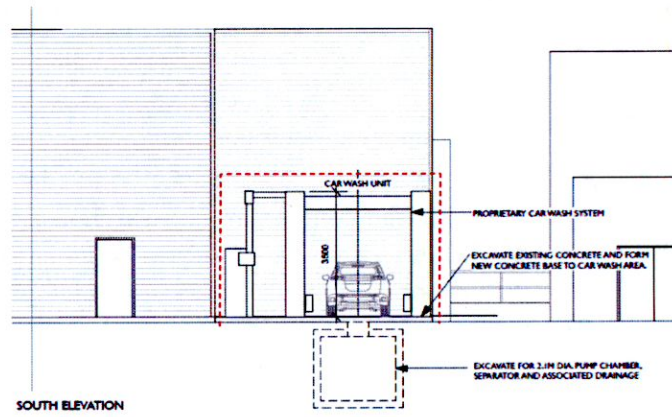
Proposed south elevation, extent of car wash outlined in red.
